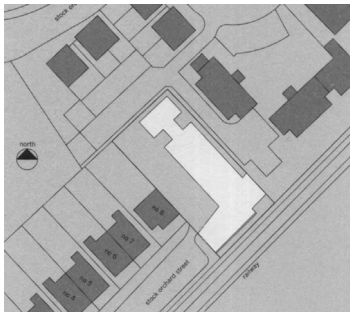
Site access to the south west and railway running along the site to the north east
